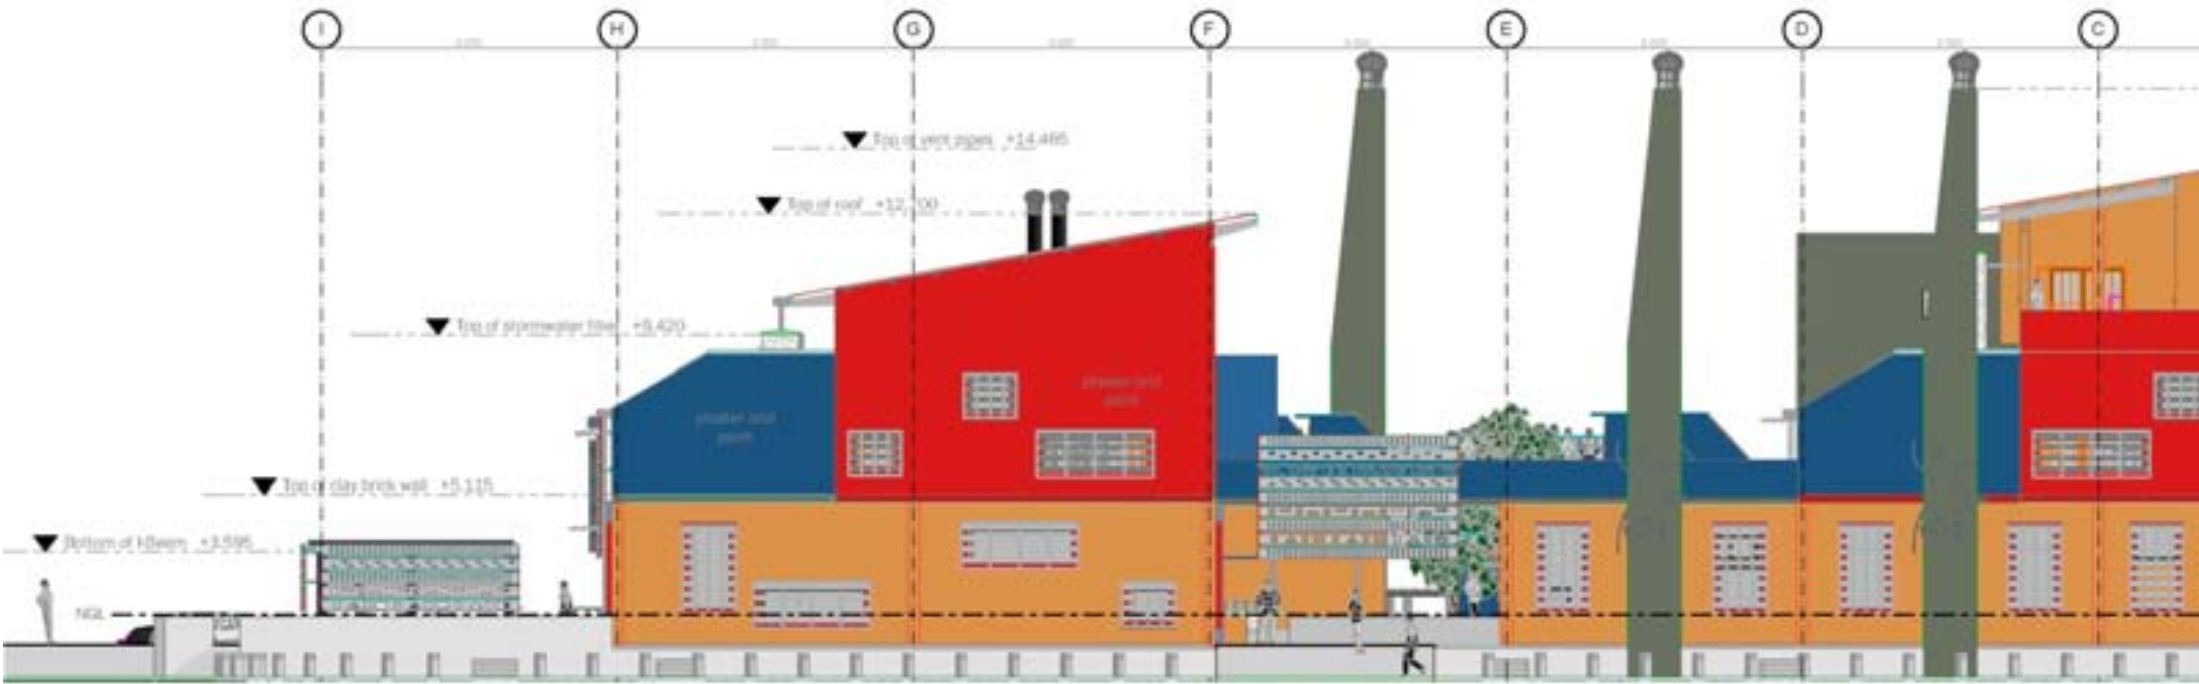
East elevation. Scale 1:200. (Author, 2009).
